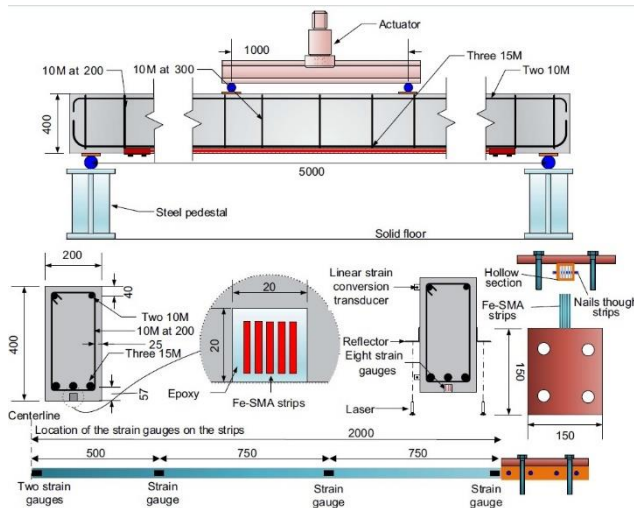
Near surface mounted SMA strips in reinforced concrete beam (El-Hacha and Rojob, 2018)
